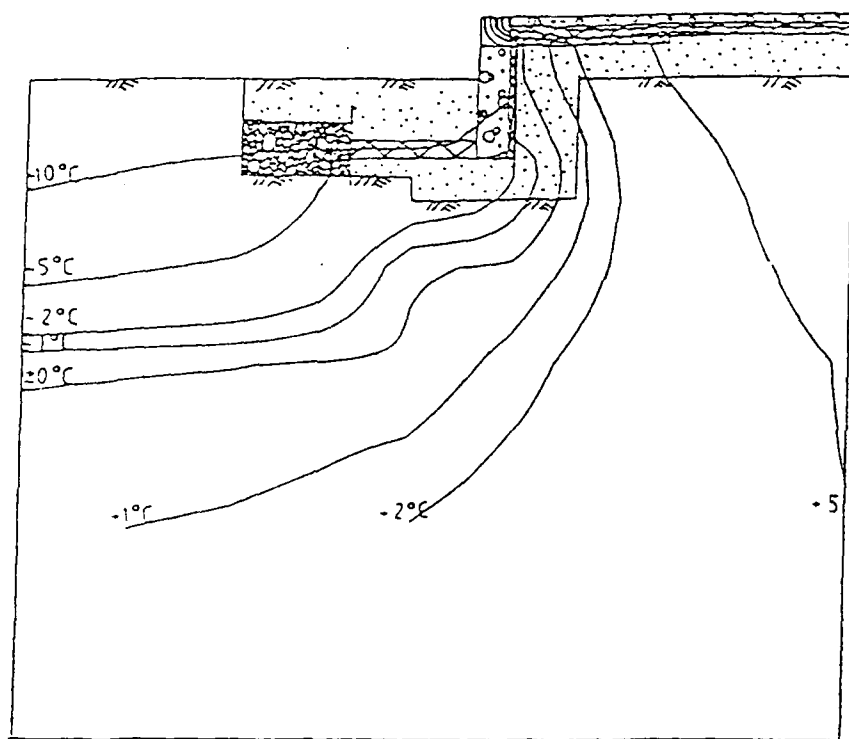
Cold bridge effect with a concrete foundation wall.
